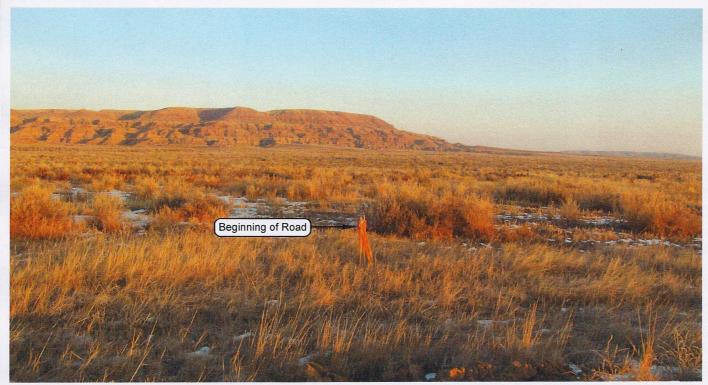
PHOTO VIEW: FROM BEGINNING OF PROPOSED ROAD
